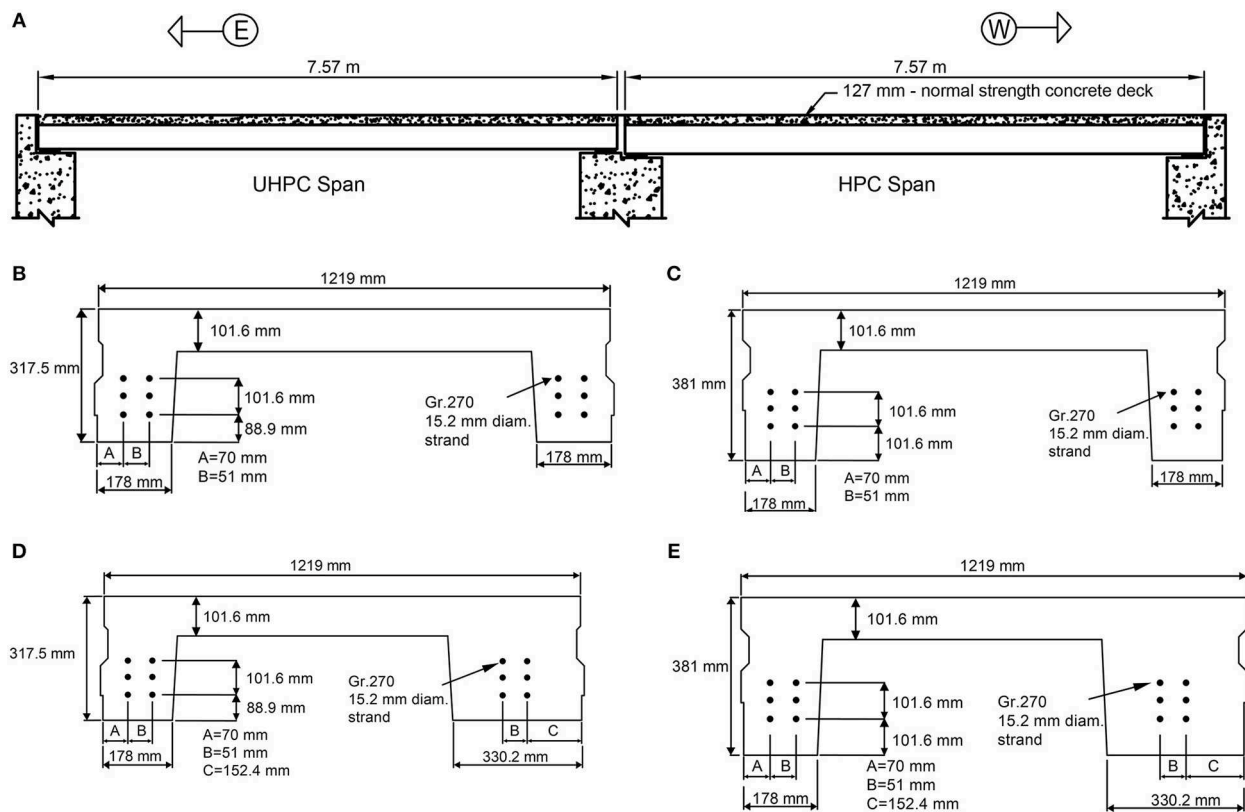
| Bridge 9706 (A) profile, (B) UHPC interior girder, (C) HPC interior girder, (D) UHPC edge girder, and (E) HPC edge girder.
